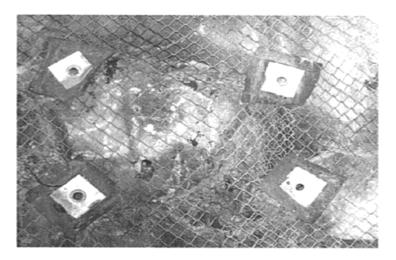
Black butterfly plates used with galvanised dome plates in highly corrosive environment.
